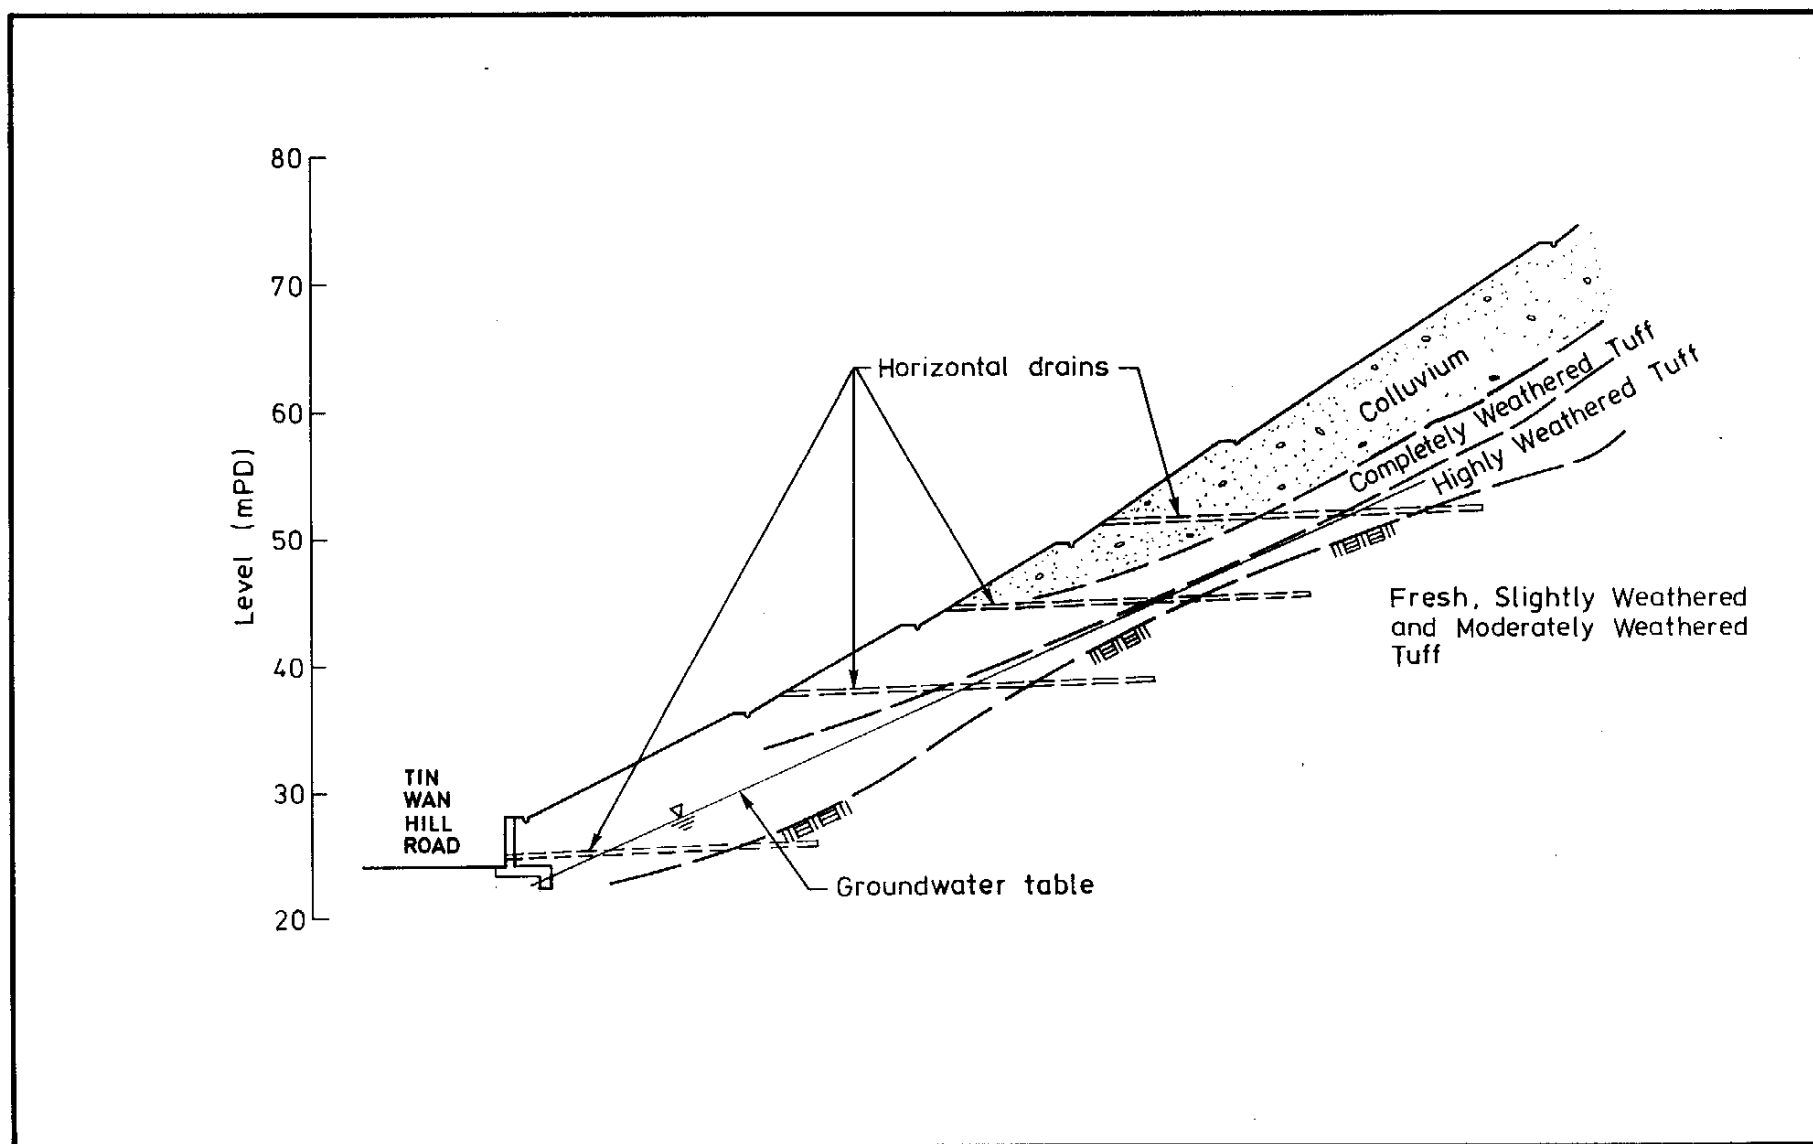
Typical Section Showing Ground Conditions and Positions of Horizontal Drains at Tin Wan Hill Road
